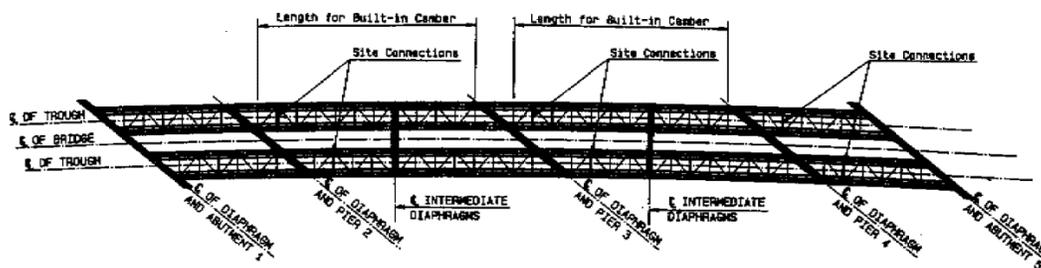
Plan of the Steel Structure with the Horizontal Bracing
